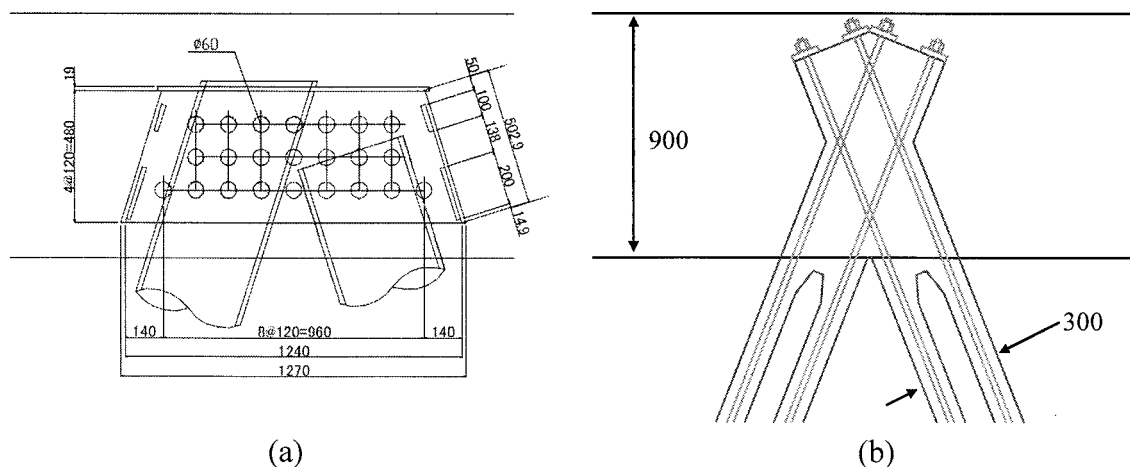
Joint systems: (a) Steel truss, and (b) UFC truss
